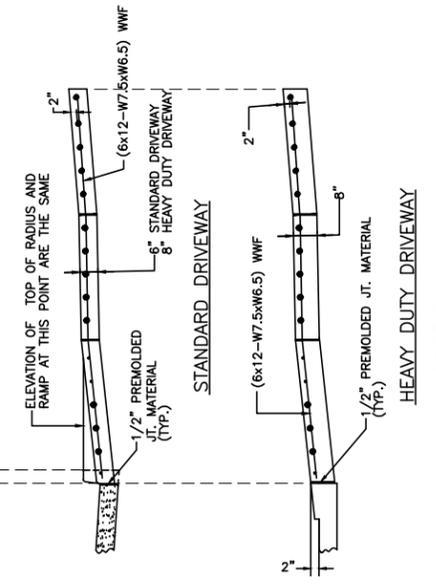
DETAIL OF STANDARD DRIVEWAY FOR CONCRETE VERTICAL CURB
